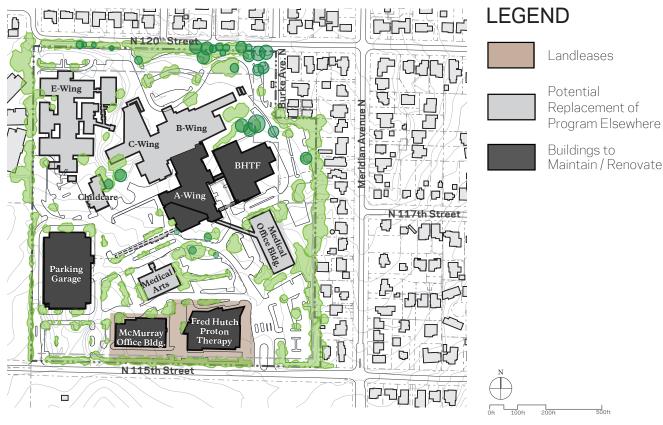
POTENTIAL BUILDING MAINTENANCE AND DEMOLITION DIAGRAM
